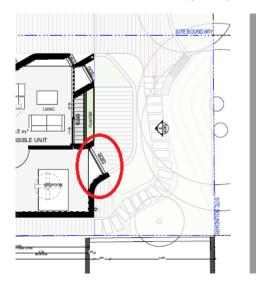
Extract of Level 1 architectural plan showing rear setback to eastern boundary (Source: Archer Office)
